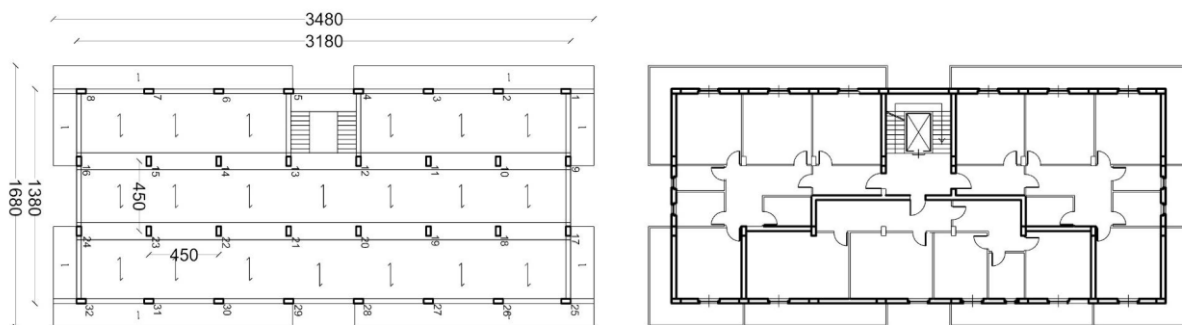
Architectural (a) and structural (b) plan of the typical building.
